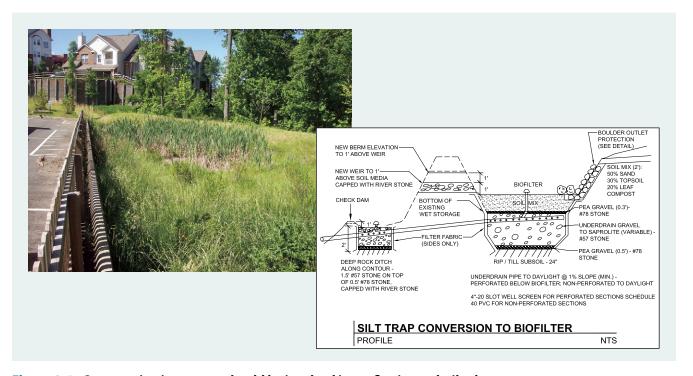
Construction inspectors should be involved in confirming as-built plans
